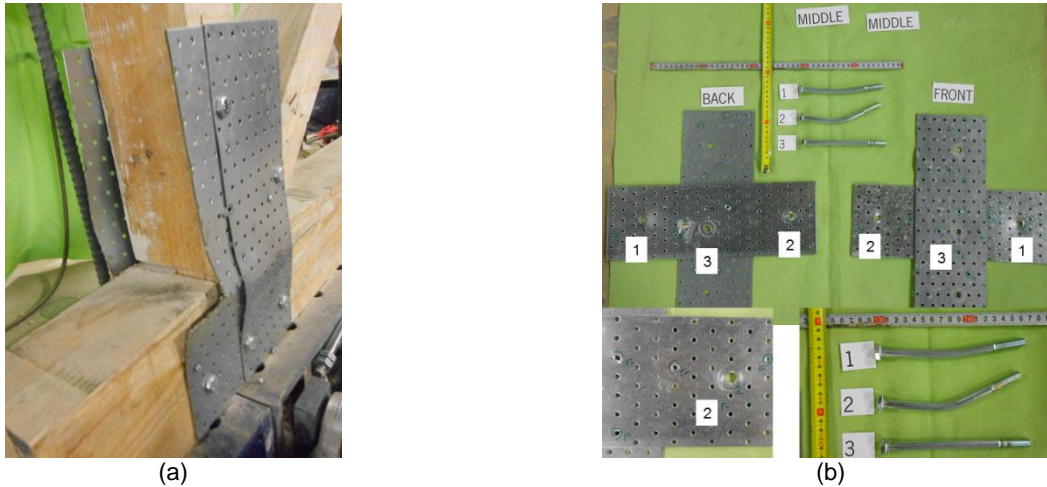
Deformations in strengthening elements: (a) buckling of bottom steel plates; (b) damages in commercial steel plate used in wall RTW50_P_M in the central connection with ovalized holes and deformed bolts.
